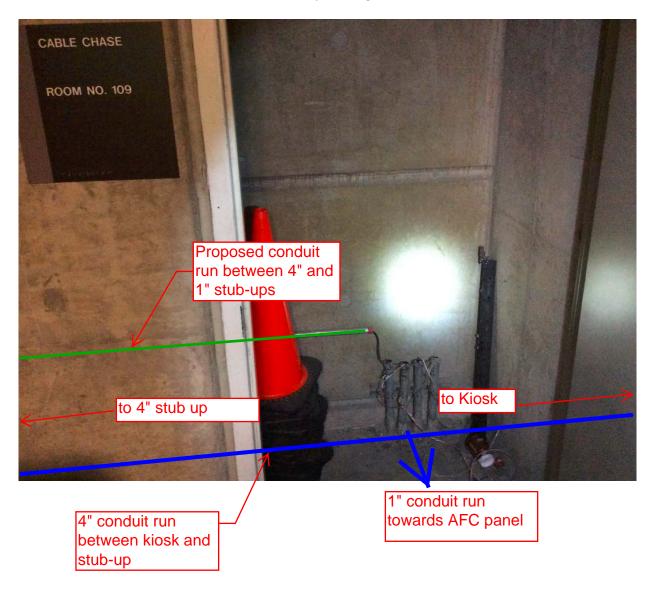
B35 New York Ave South: AFC Panel near 1 inch stub up
